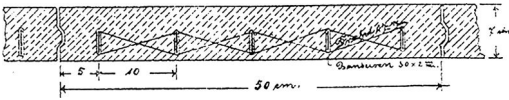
Cross-section of “Wygasch” precast RC plate (City Building Archive).
